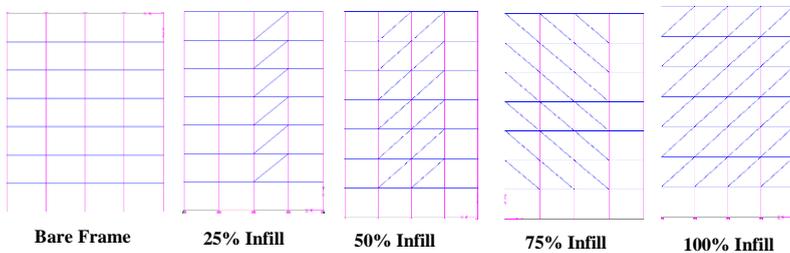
Elevation view for Bare Frame, 25%, 50%, 75%, 100% infill
